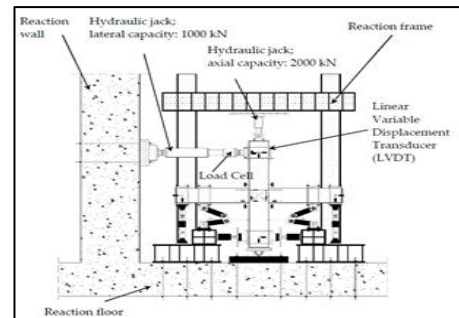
Loading set up on an interior beam-column sub-assembly specimen.
